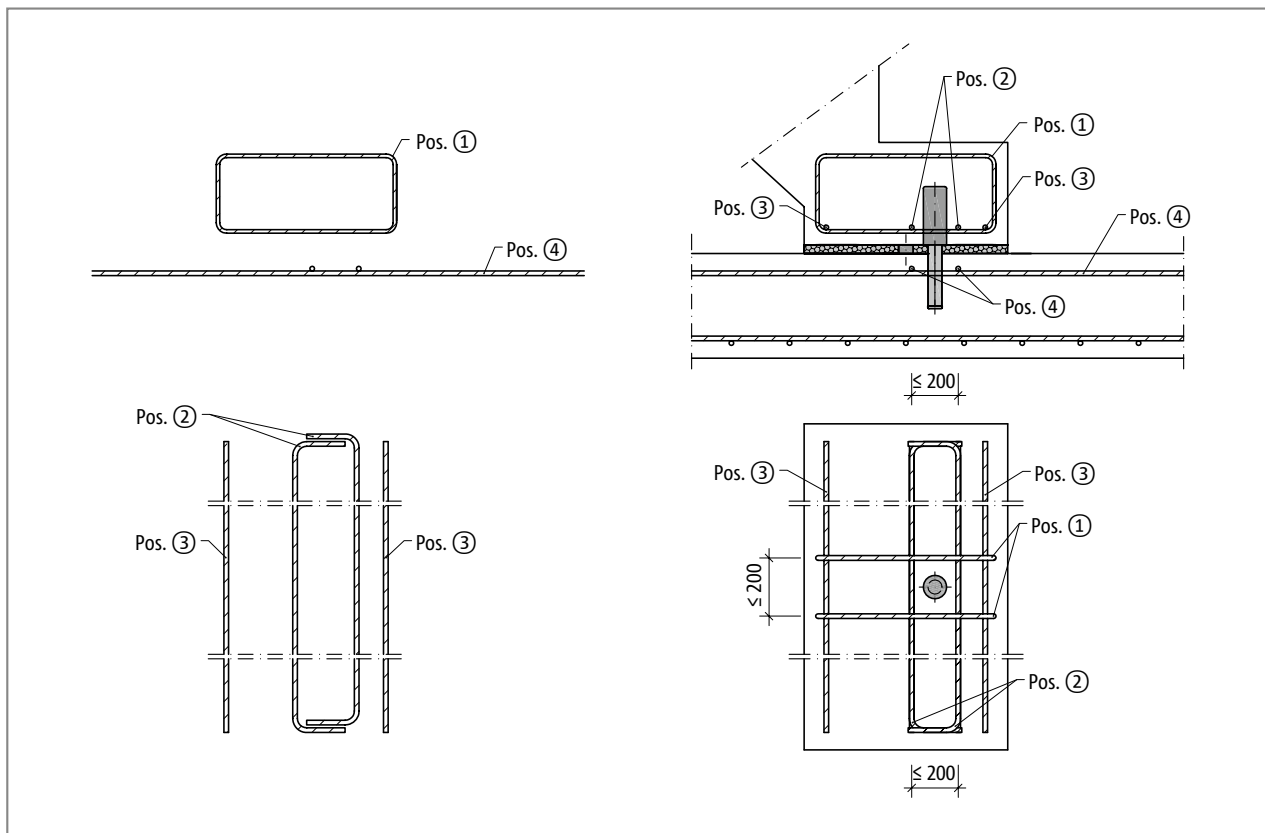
Schöck Tronsole® type D: On-site reinforcement
